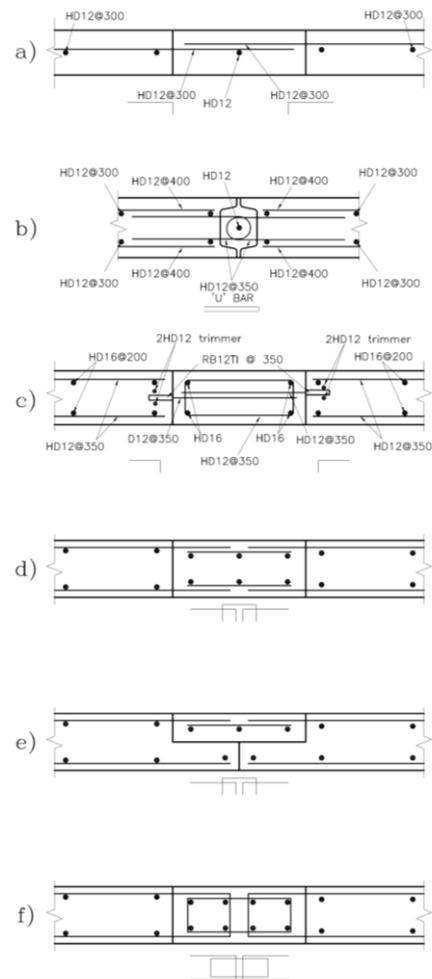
Examples of different types of vertical cast-in-place connections (plan view)
